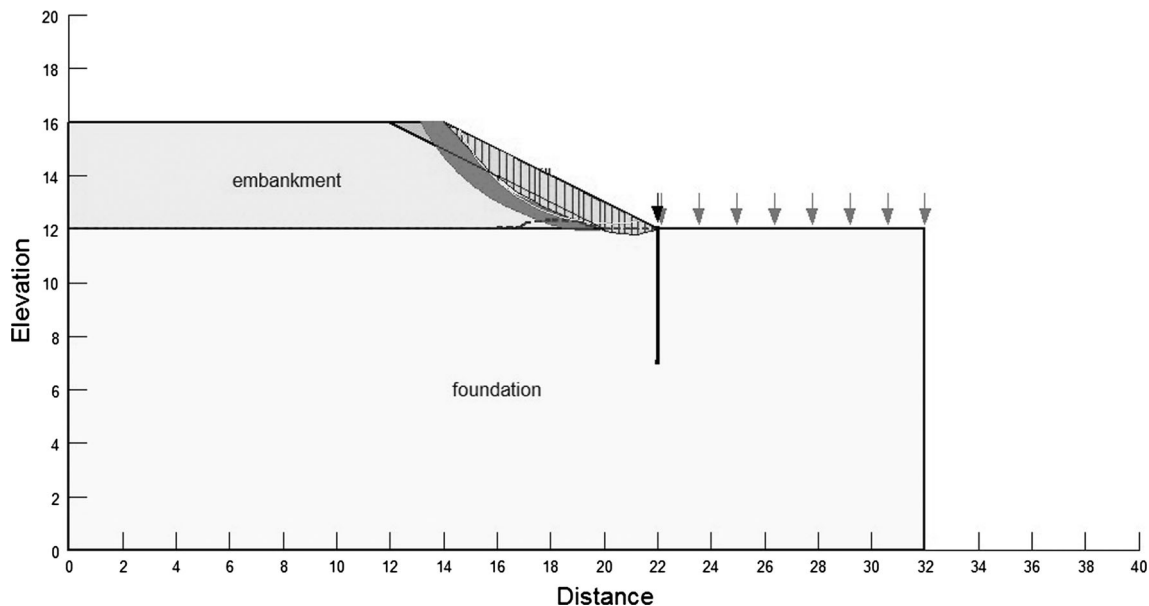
Critical slip surface within the embankment with rockfill berm and sheet piling in place
